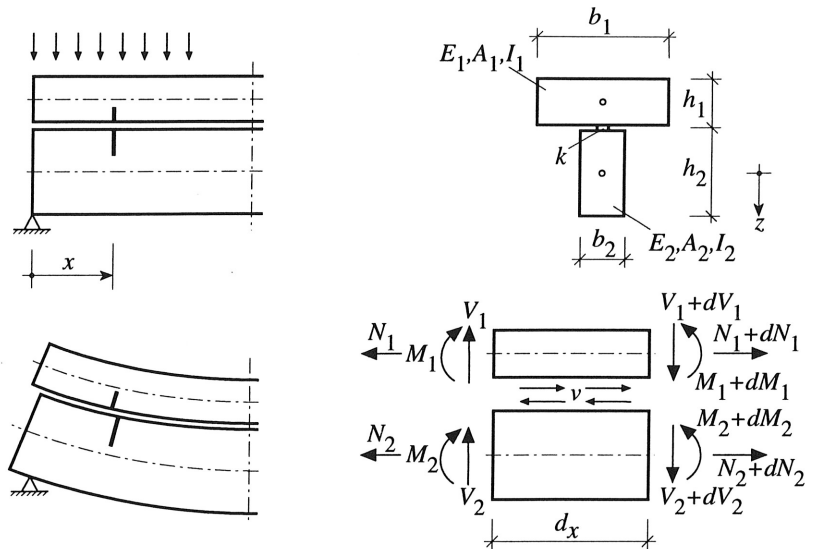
Beam details and equilibrium of an incremental element. System, cross-section, deformations, element  $dx$ .
